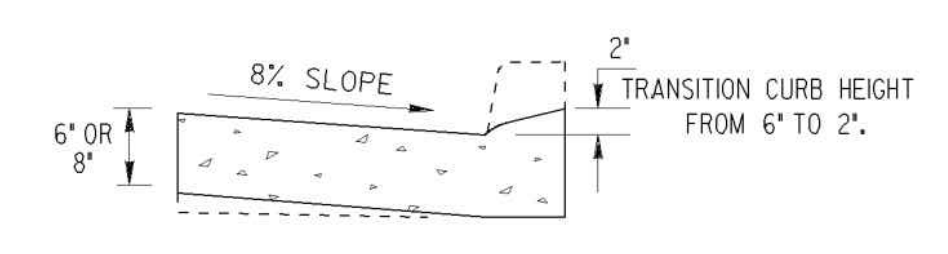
DETAILS OF RECESSED CURB FOR DRIVEWAYS
